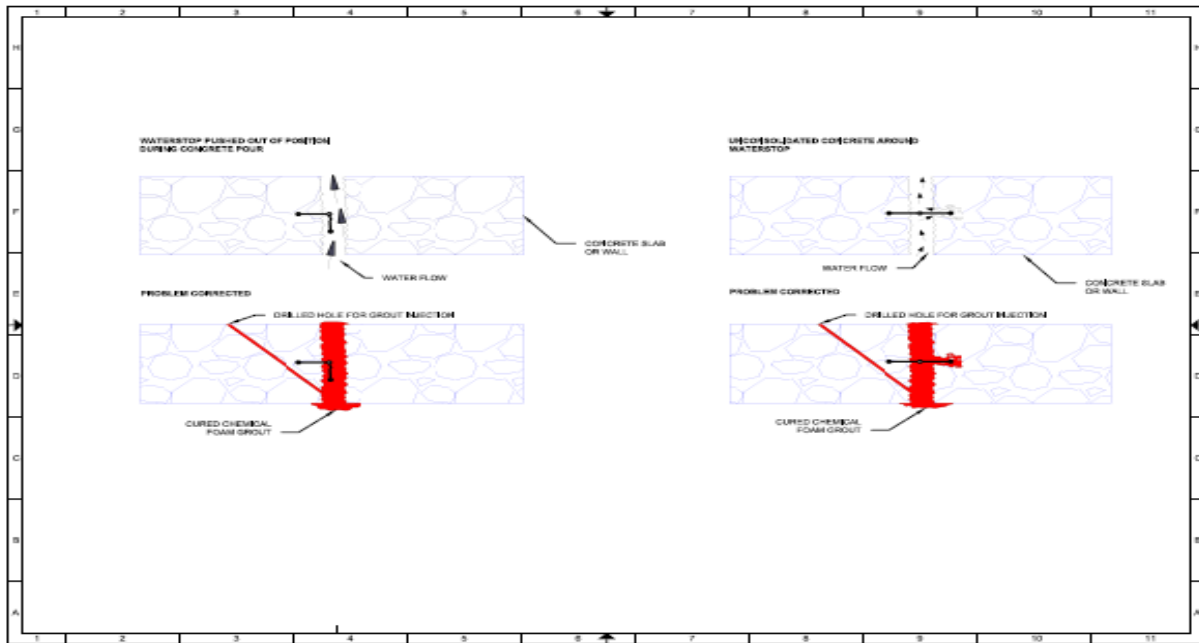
Repair of Embedded Water-Stops due to original Construction Defects in the forms of misplacement and lack of concrete consolidation (i.e., honeycomb).
